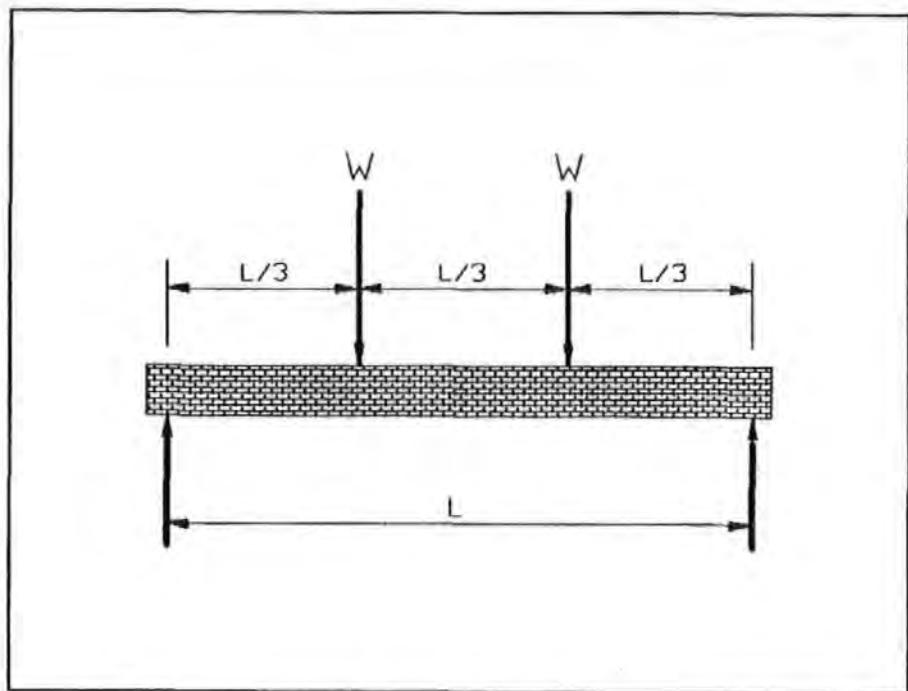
UOP Quetta Style Test Beam. Loading Arrangement
